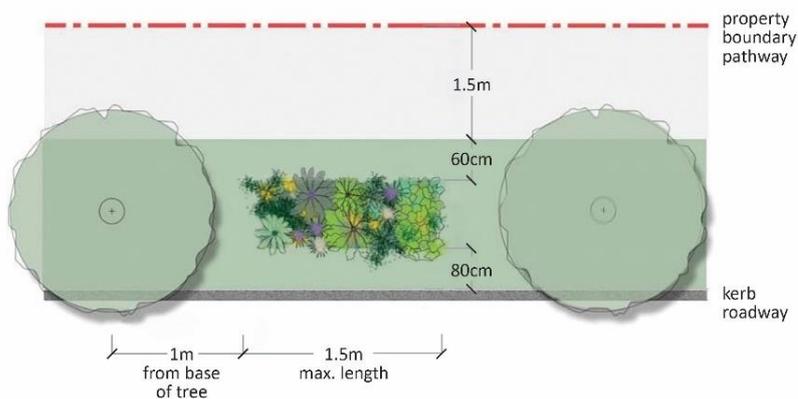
An 80cm access area must be maintained between the kerb and planter boxes. A 60cm access area must be maintained between raised beds and the footpath. A diameter of 1m around a tree must remain unplanted and free of planter boxes so as not to damage roots. Planter boxes must not exceed than 1.5m om length.
